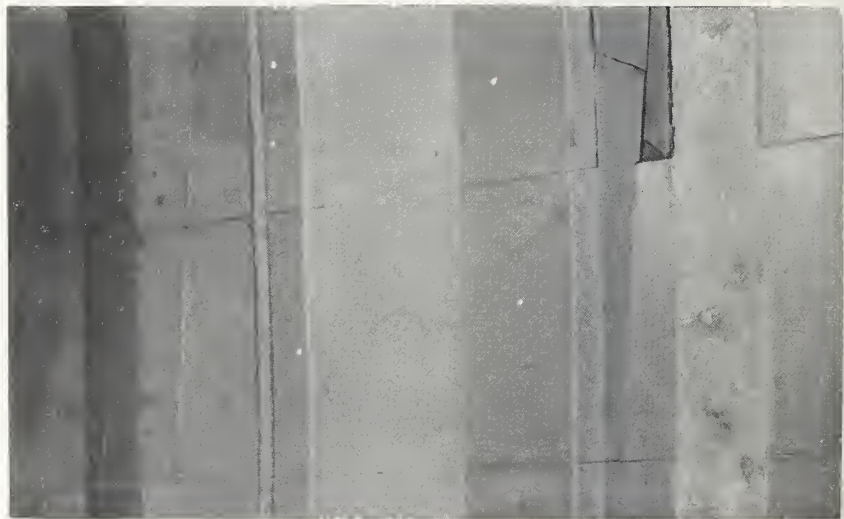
$\frac{3}{16}$ -in. asphalt tile on concrete subfloor (test panel 13L).
